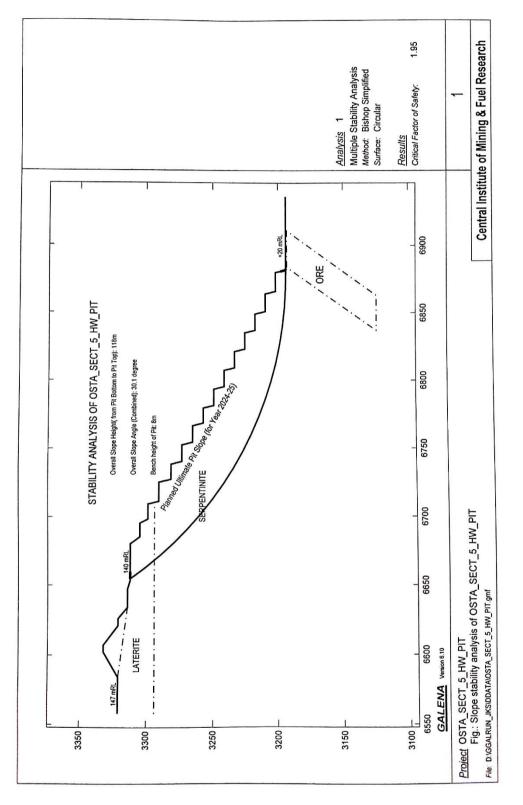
Stability analysis of planned Hangwall Pit along Section Sect-5
